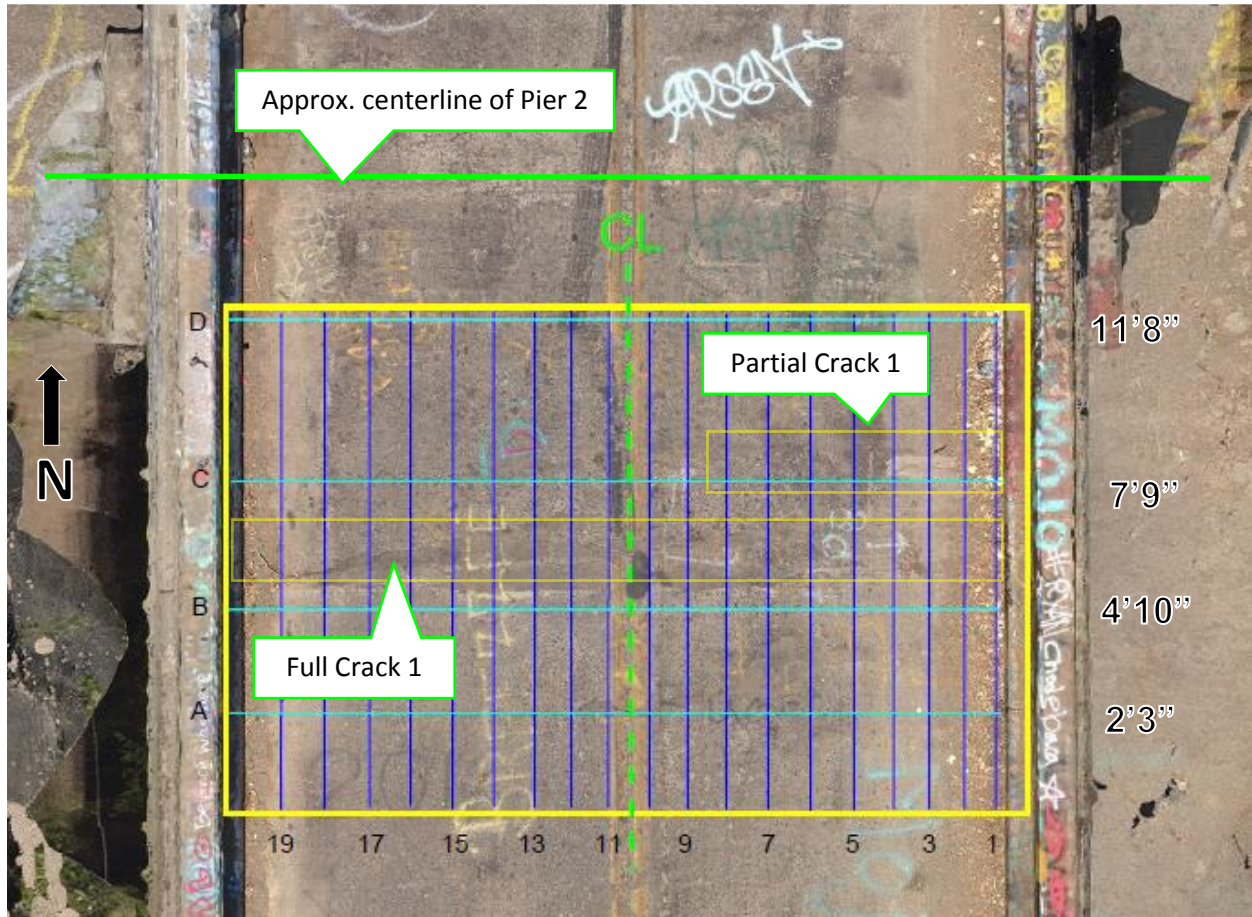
Approximate GPR scan lines at Abutment 1/Pier 2 bridge deck
